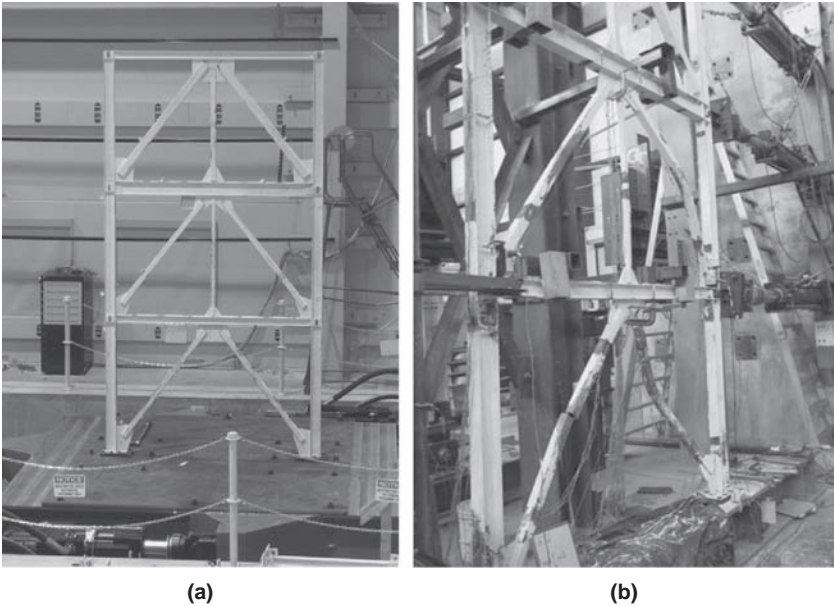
Zipper frame tests: (a) shake table test specimen (*Courtesy of Andrei Reinhorn, Department of Civil, Structural, and Environmental Engineering, University at Buffalo.*); (b) static test specimen. (*Courtesy of C.S. Yang, and R.T. Leon, Department of Civil and Environmental Engineering Georgia Tech.*)
